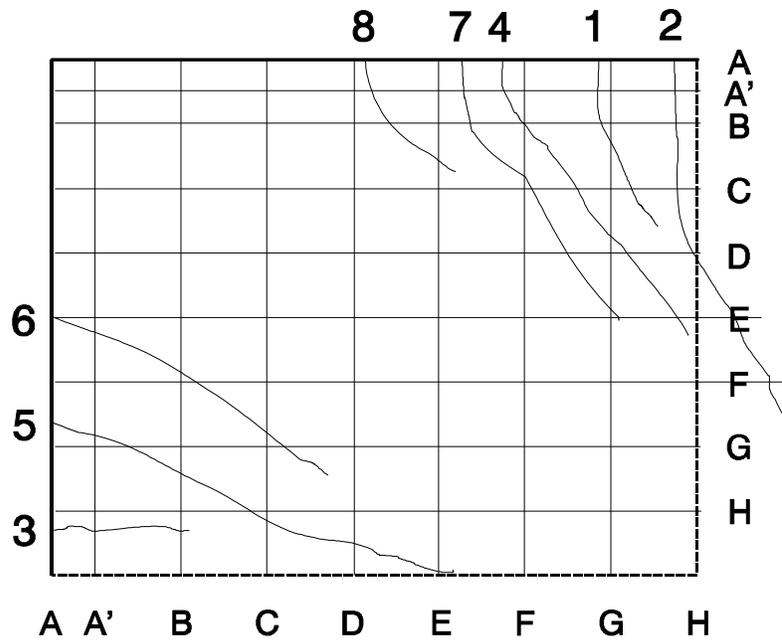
POJ-RC-100 cracking pattern on north face of joint at dead load
